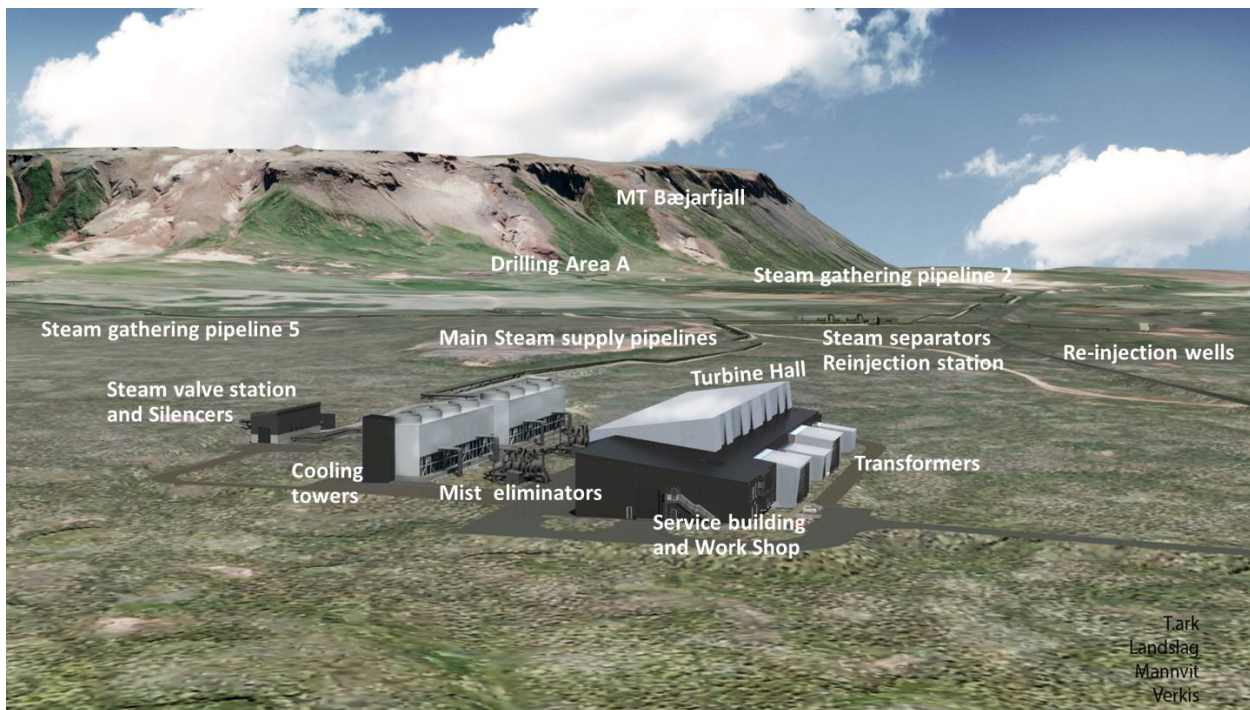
Overview of the power plant, showing the power house, consisting of turbine hall, service building and workshop, cooling towers and buildings and equipment of the steam supply.
